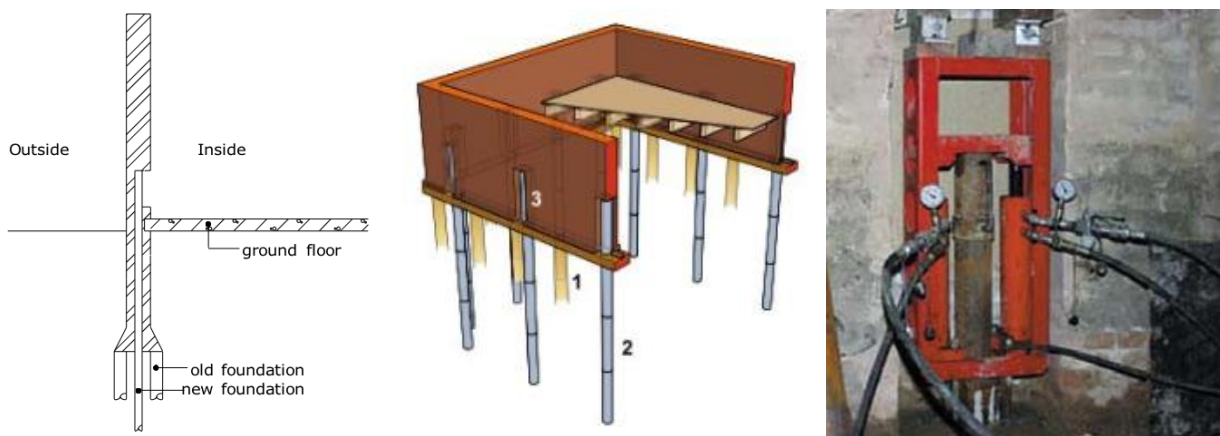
Left: schematic section of piles pressed from the wall; middle, 1 old wooden piles, 2 new piles, 3 wall opening of new foundation; right: set up of pipe pile pressing in the wall opening (van Etten et al., 2007; VROM, n.d.)
